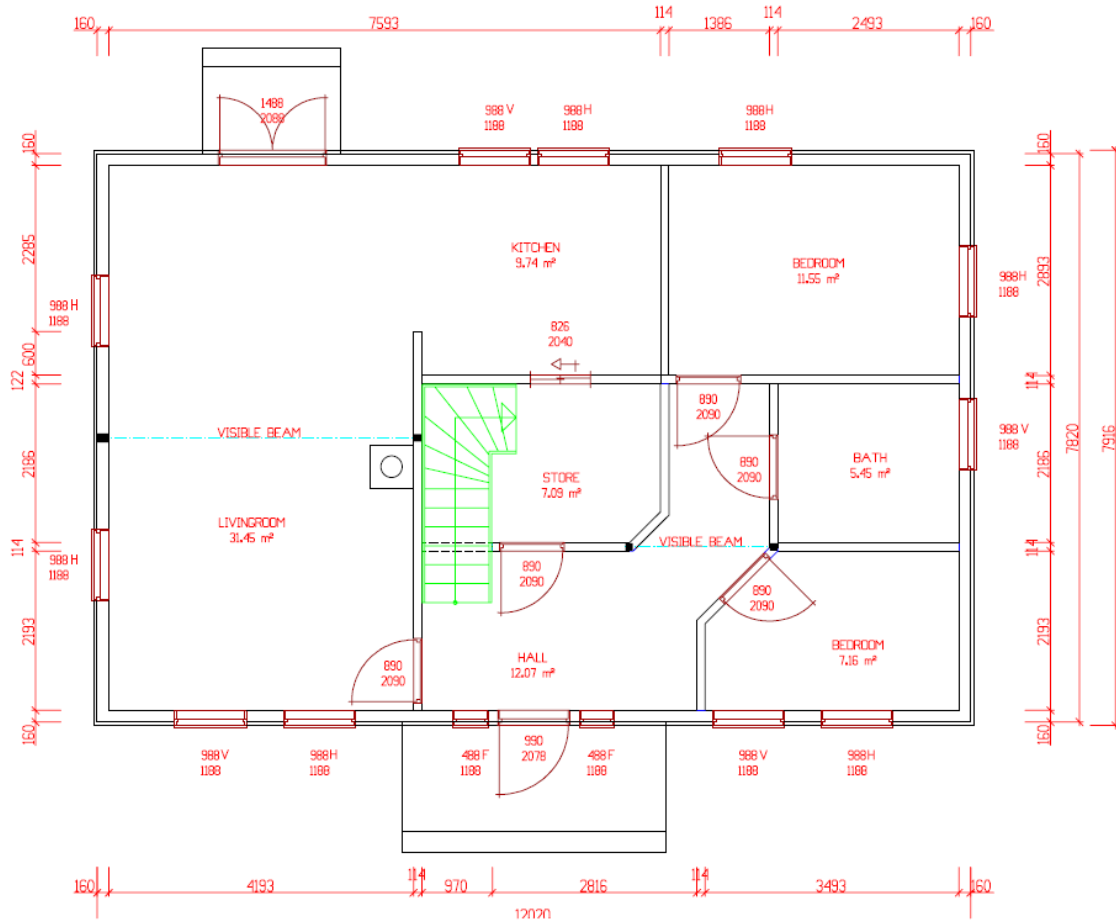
Ground floor plan of Lykkebo with dimensions in mm^{13}
